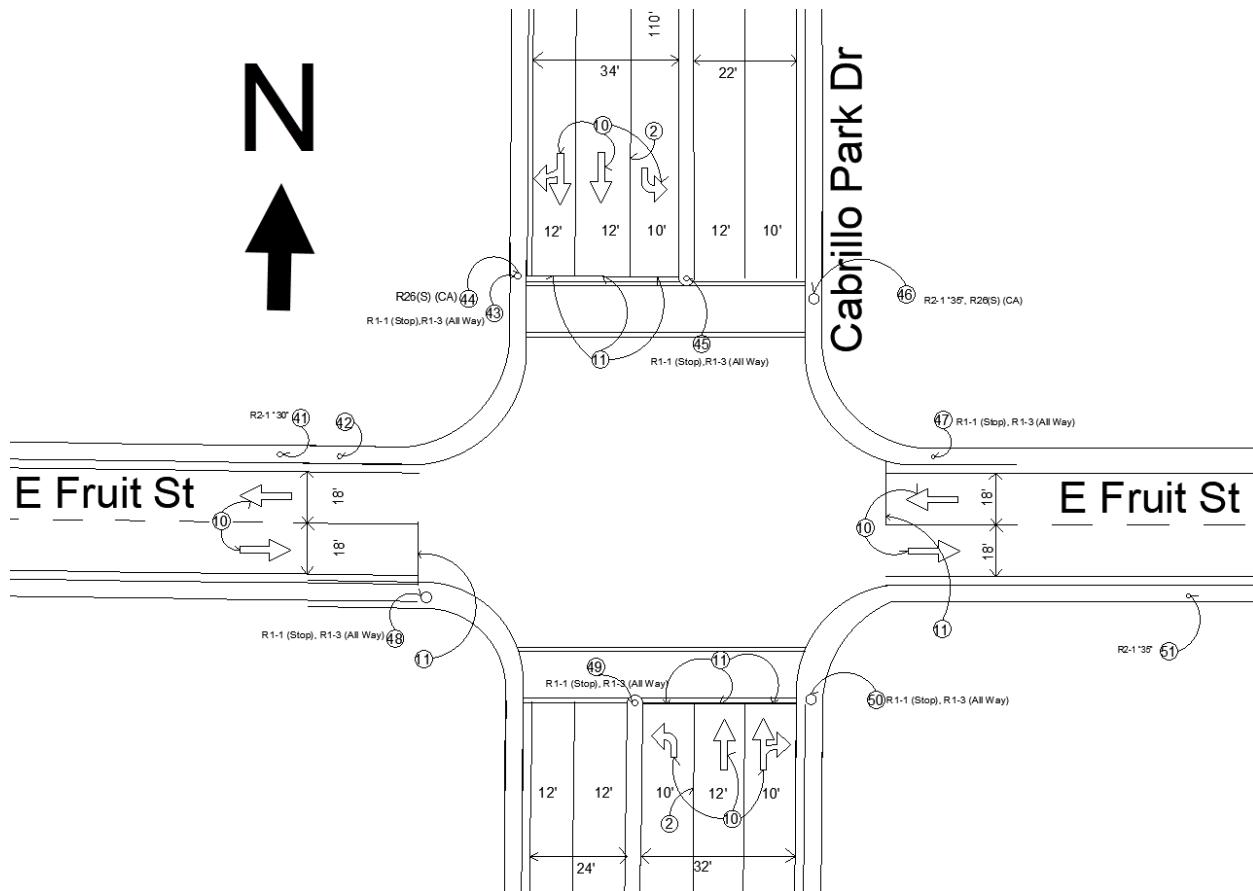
Existing Conditions - Cabrillo Park Drive & E Fruit Street
